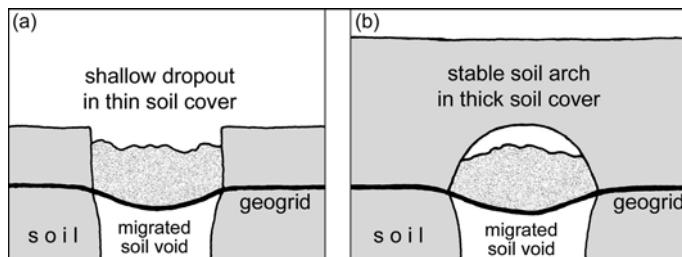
Sinkhole prevention by geogrid installed within soil profiles: (a) development of only a shallow dropout where cover is thin; (b) development of a soil arch in a thick soil over the geogrid.
